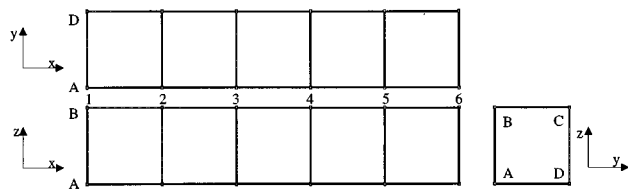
Plan view, side view, and cross section of *cubic truss*.
